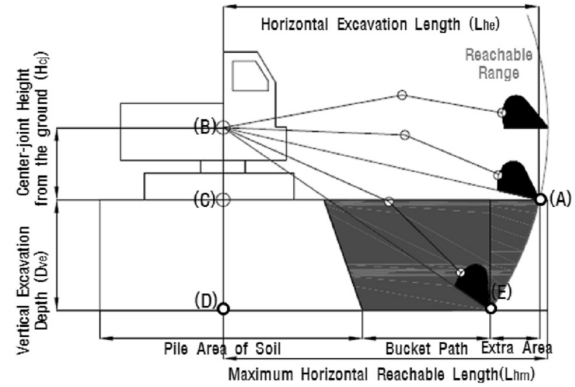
Longitudinal Section Drawing of Local Area considering Excavator's Specification
